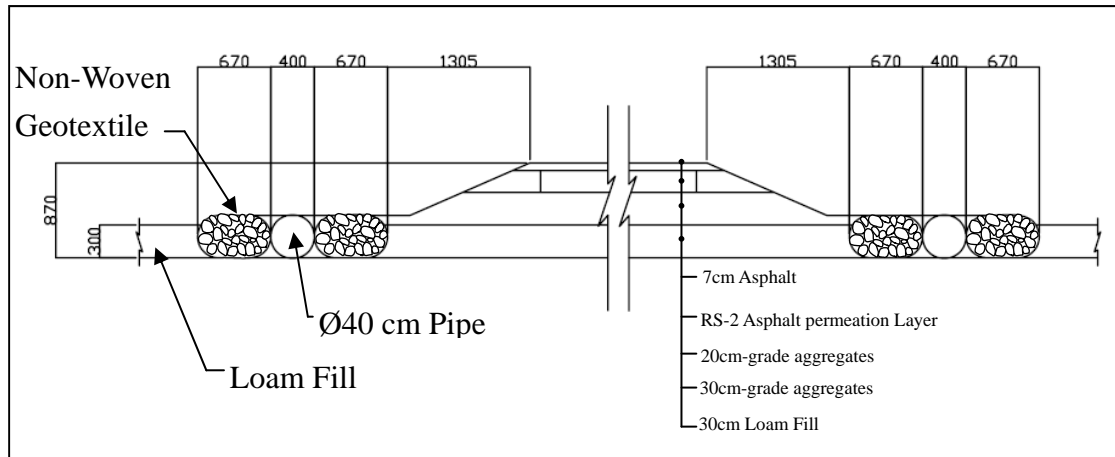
Design Profile of Main Road and Drainage Pipe, Redraw from the Original Drawing
